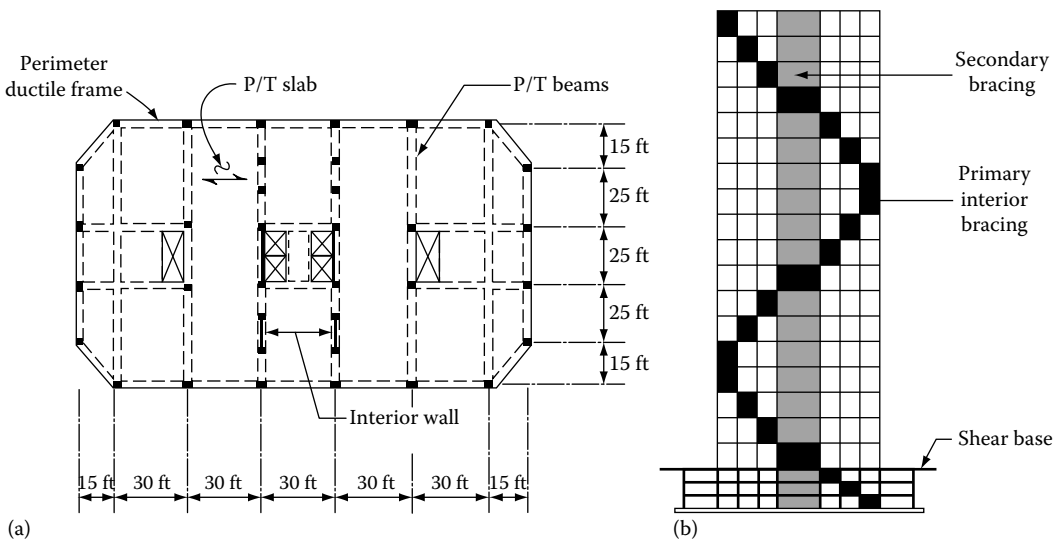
Full depth interior shear walls acting as gaint K-brace. (a) Plan and (b) schematic section.
